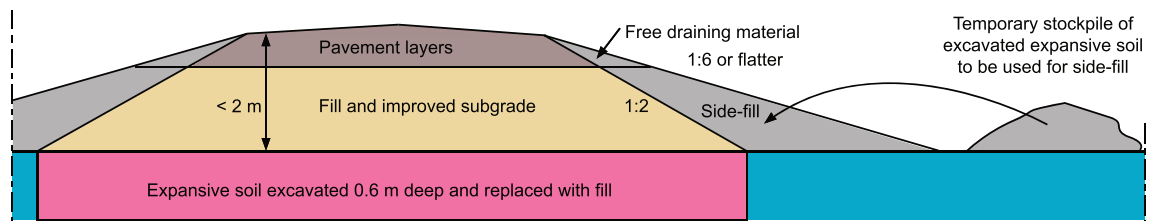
Construction on expansive soils (embankment height < 2m)
